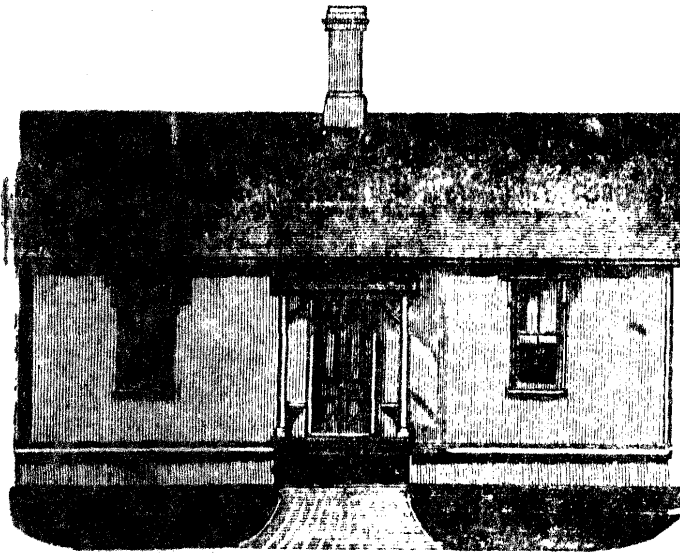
ELEVATION OF ONE-STORY HOUSE.
